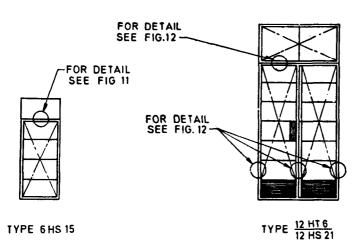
Location of Parts of Steel Doors, Windows, Ventilators and Sub-Lights for Which Details are Shown
